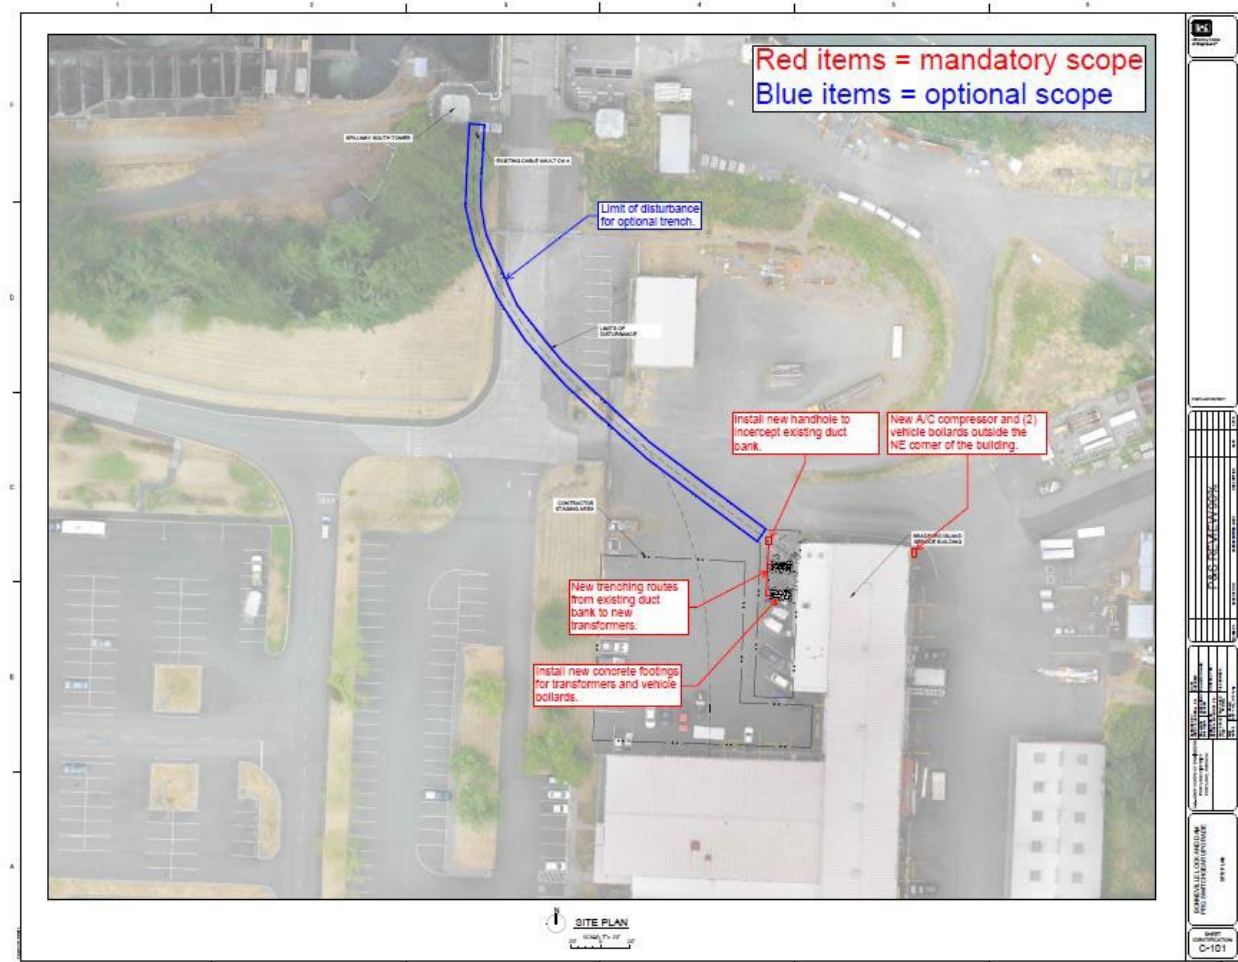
Service Building Substation Upgrade and Replacement Project Work Plan
